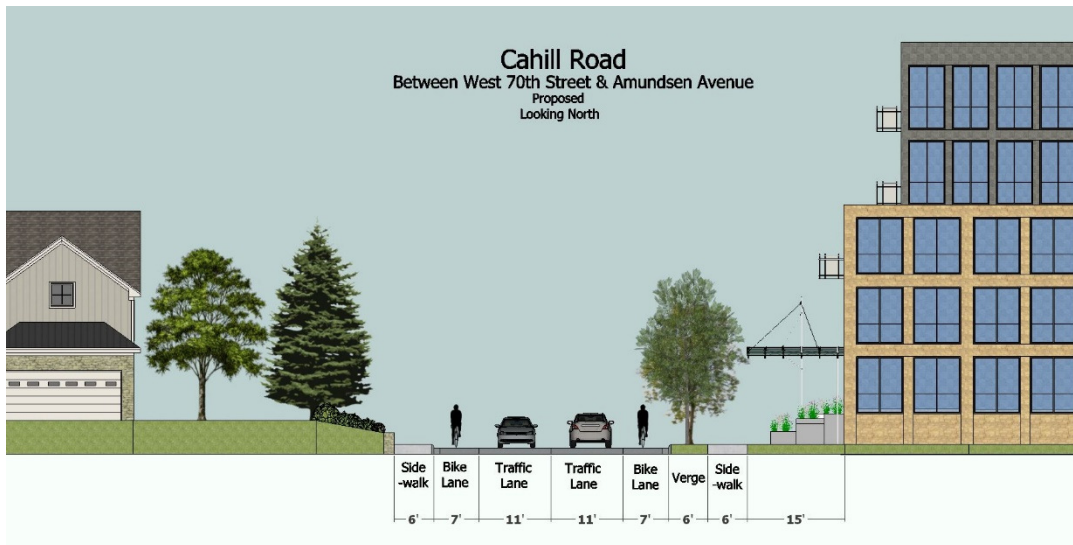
Cahill Road Configuration showing auto lane, bike lane, boulevard planting, sidewalk and building with 15 foot setback from the sidewalk along Cahill Road.
